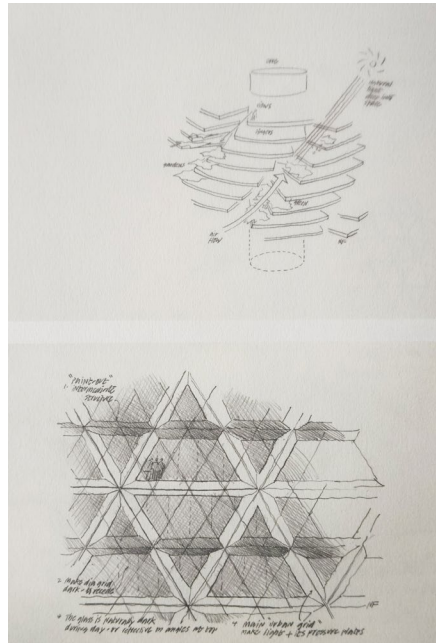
Sketches for the Gherkin - Facade detail and internal structure.
